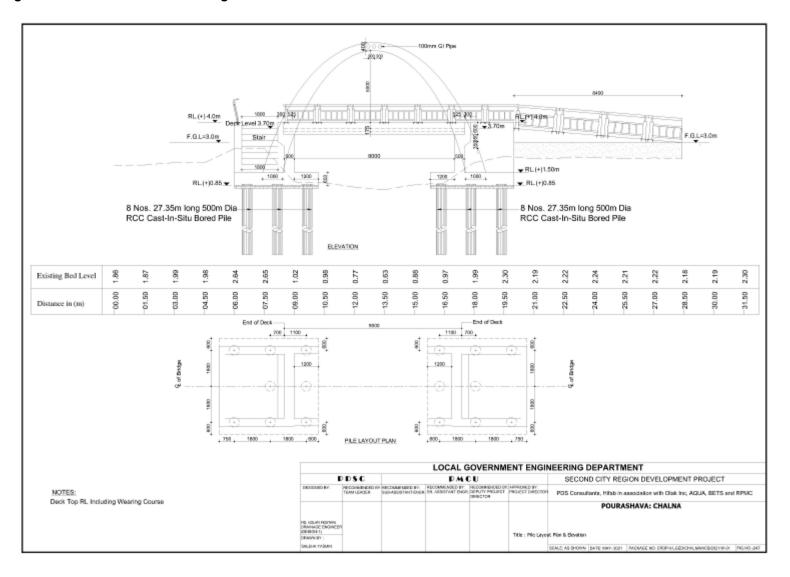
Construction of 8m bridge at Ch. 560m on Choto Chalna khal
